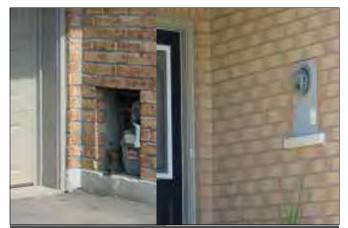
Place hydro and gas meters and other utilities in concealed or recessed locations
